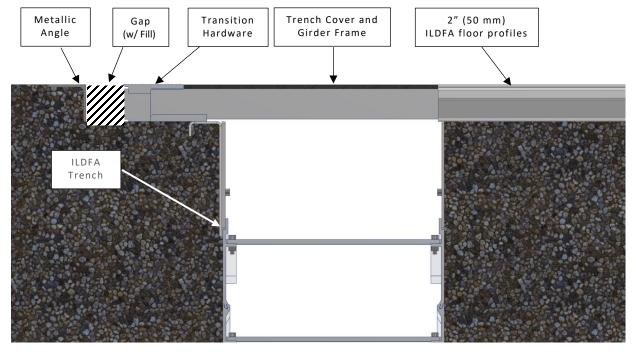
Transition from Hangar Slab to ILDFA at trenches
